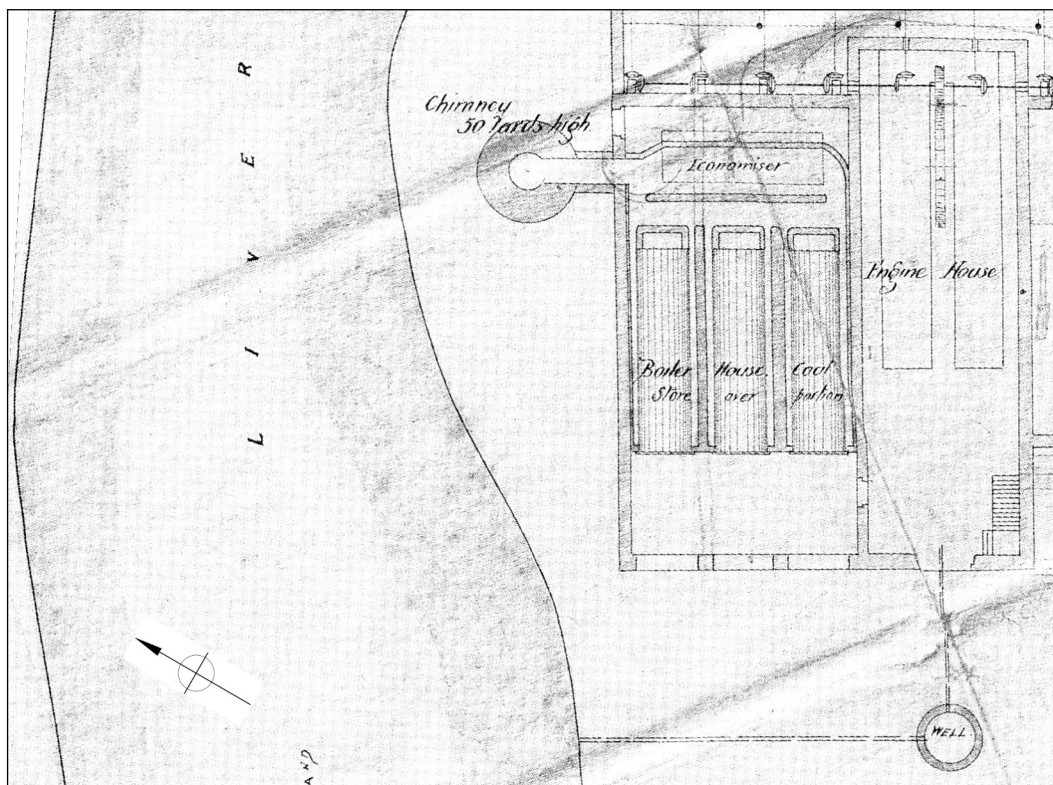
Part of 1891 plan, showing boiler house, engine house, and chimney
